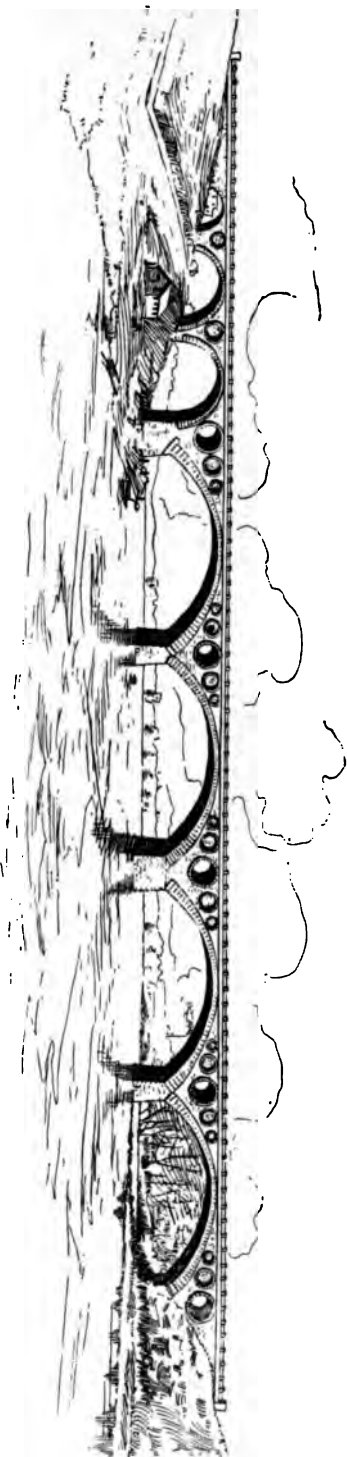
KNOXVILLE STONE BRIDGE DESIGN.
